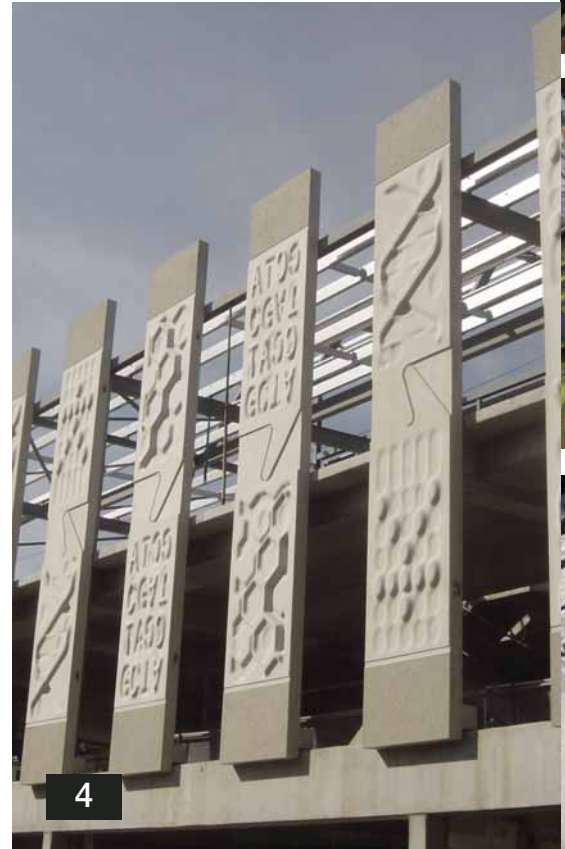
expresses the structure and the precast facade elements; producing a quite different feeling. The facade is seen to be composed of a structural frame with superimposed precast panels.
